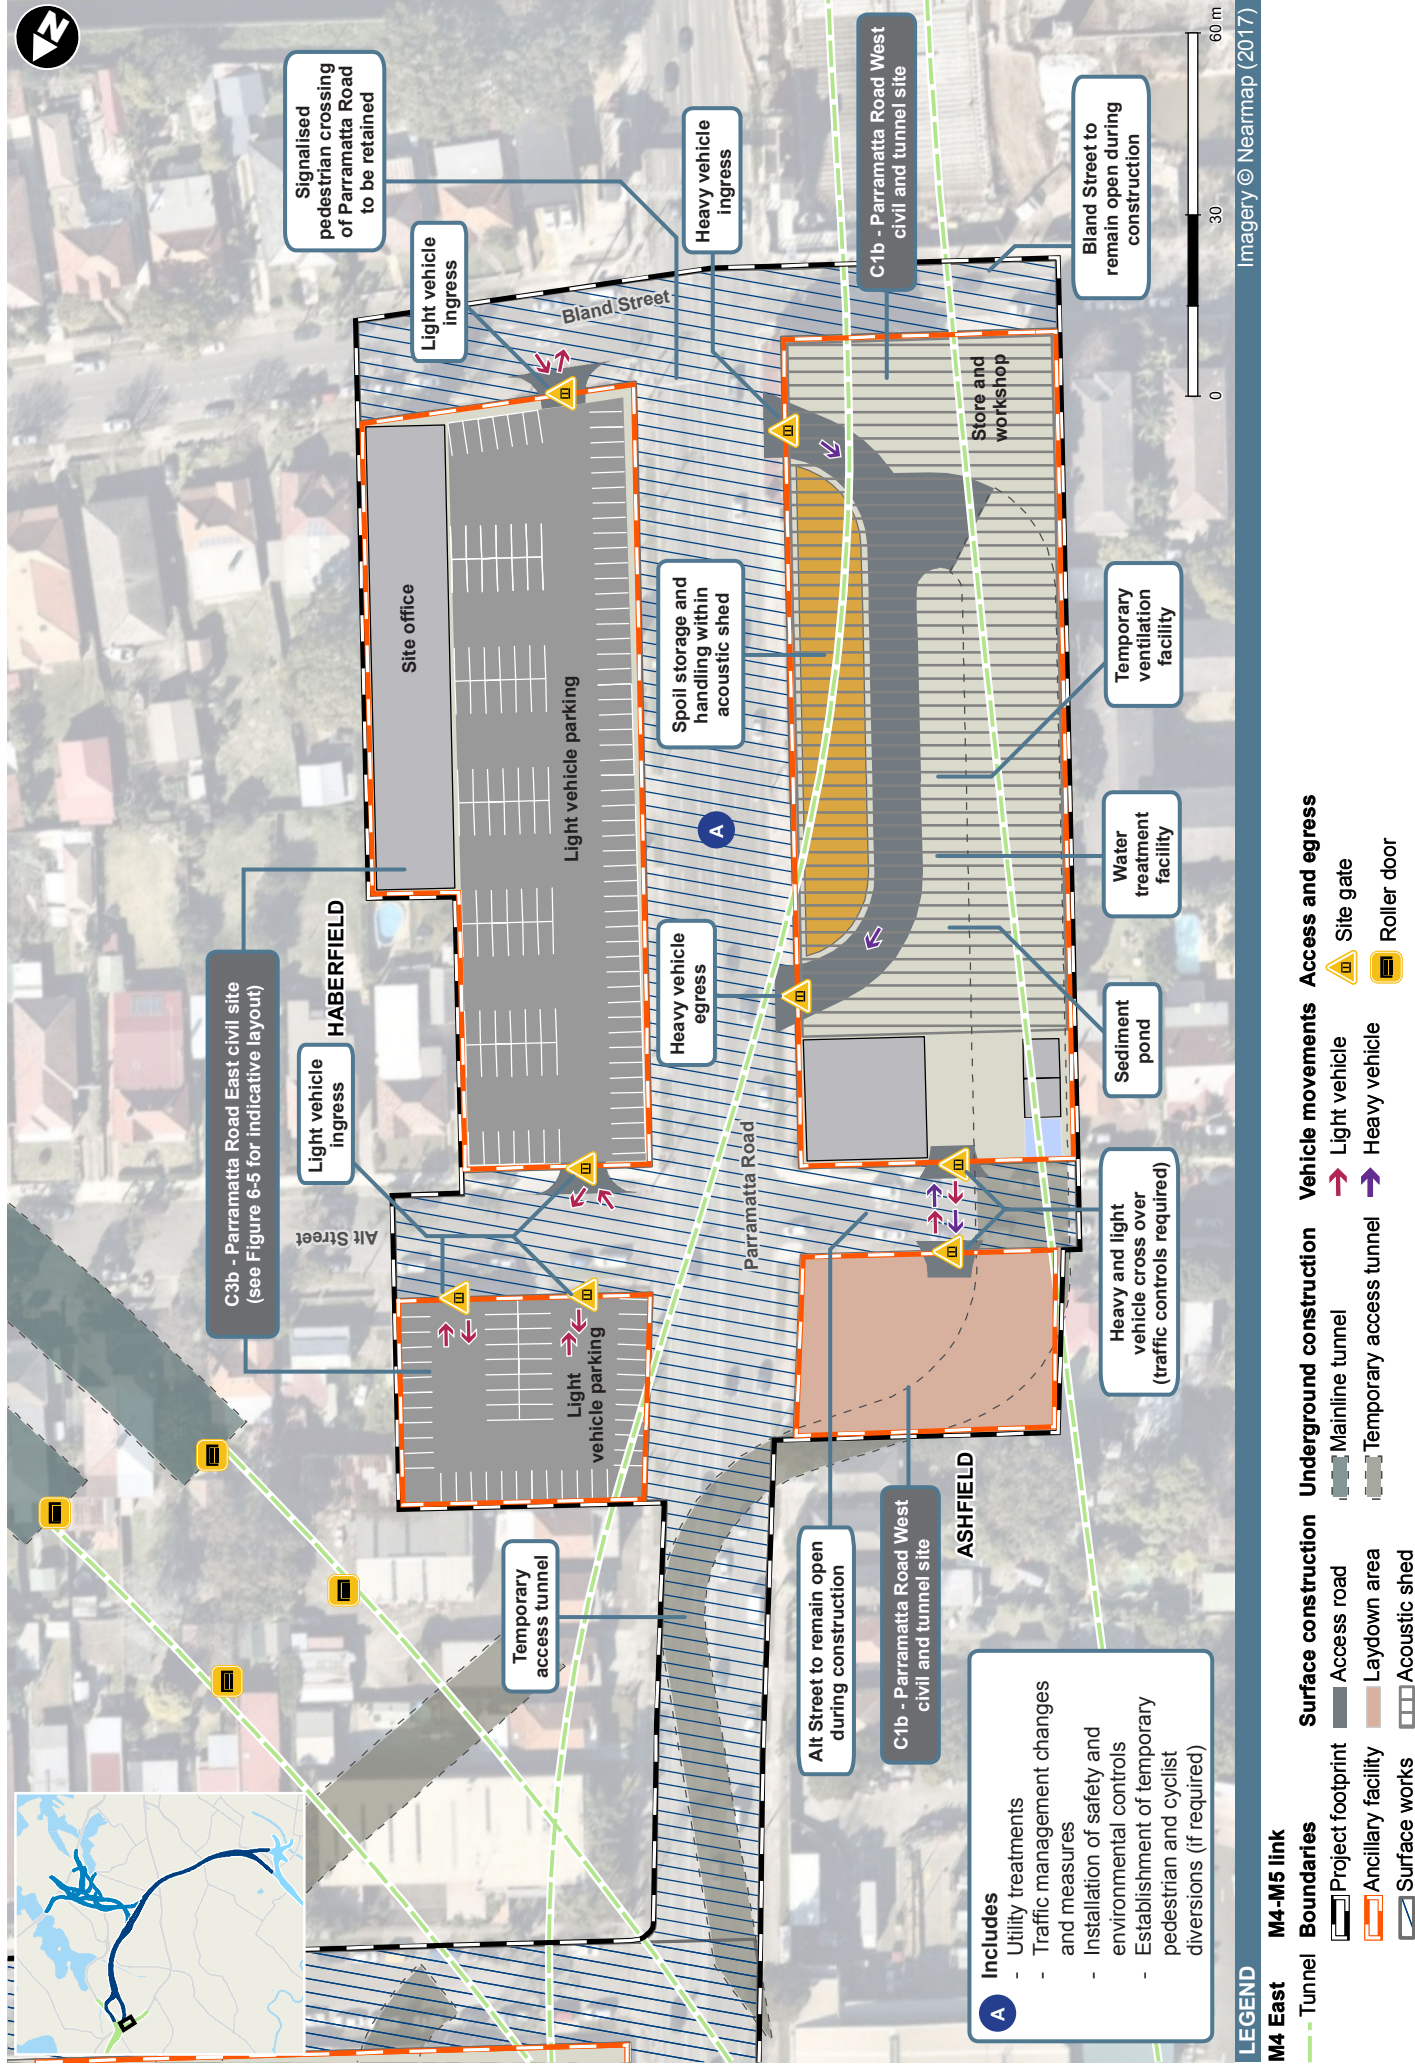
Indicative Parramatta Road West civil and tunnel site (C1b) and Parramatta Road East civil site (C3b) layout
